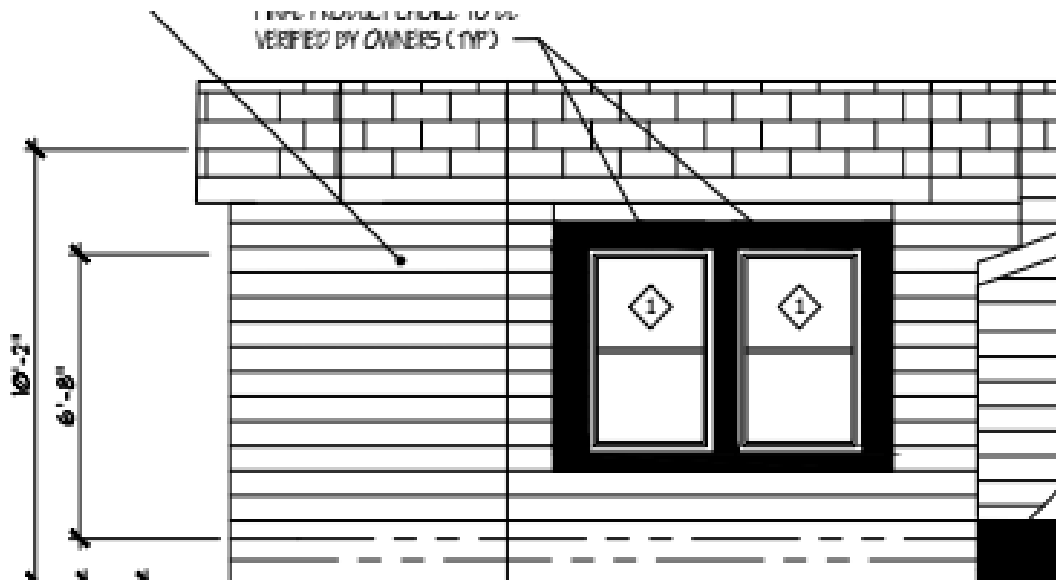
Corrected view of shed dormer to reflect siding instead of roofing shingles.
